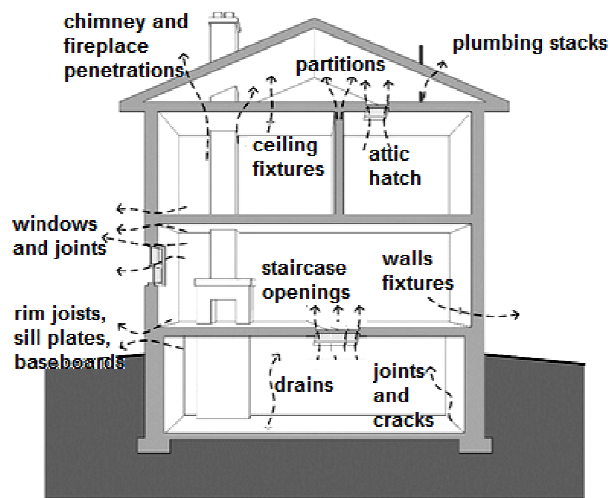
Airflow through horizontal and vertical openings in a house (Straube, 2008).
